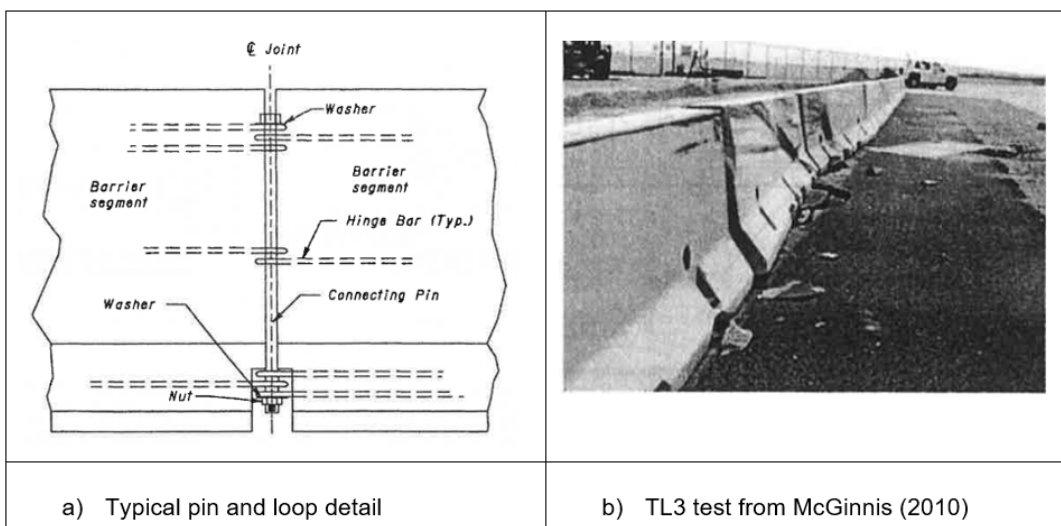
Precast concrete barrier detail and photo (McGinnis, 2010)
